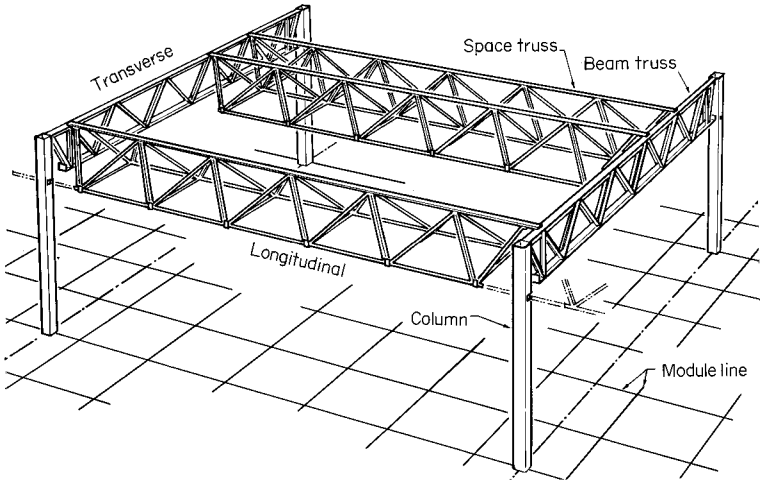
Cold-formed steel members used in space grid system. (*Butler Manufacturing Company.*)
